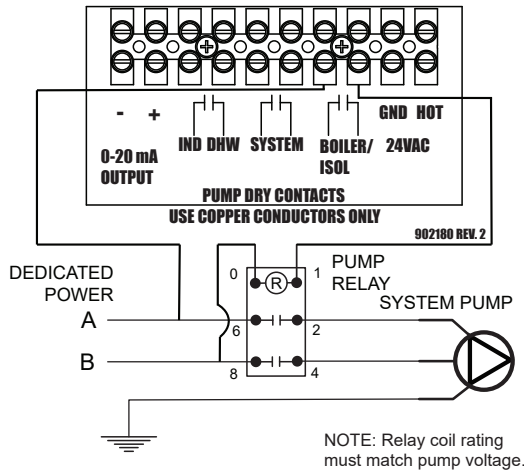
Boiler Pump Wiring Diagram (Relay coil rating must match pump voltage rating)
